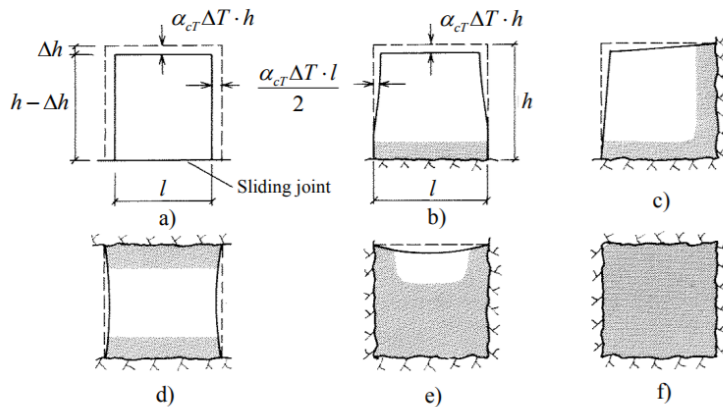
Different boundary conditions for a structural member (Engström, *Restraint cracking of reinforced concrete structures*, 2014).
